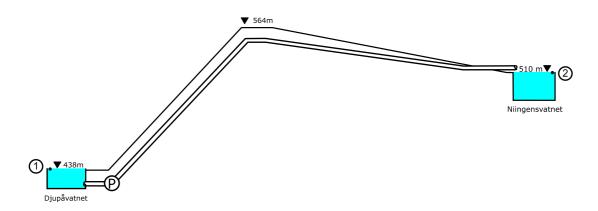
A simplified side-view illustration shows the lengths and elevations of the pumping plan from Djupåvatnet to Niingensvatnet with no tunnel
